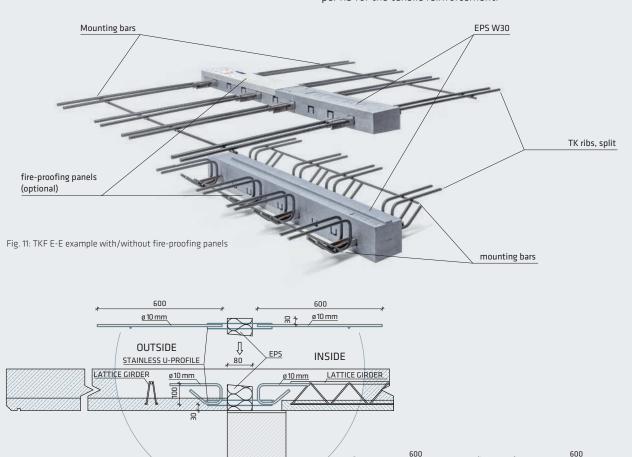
Cantilevered balcony slab with split TKF E-E rib
